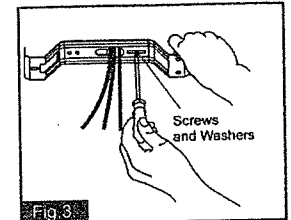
Secure the mounting plate to the electrical ceiling outlet box with two mounting screws and lock washers (Not provided as they come from your ceiling box).
